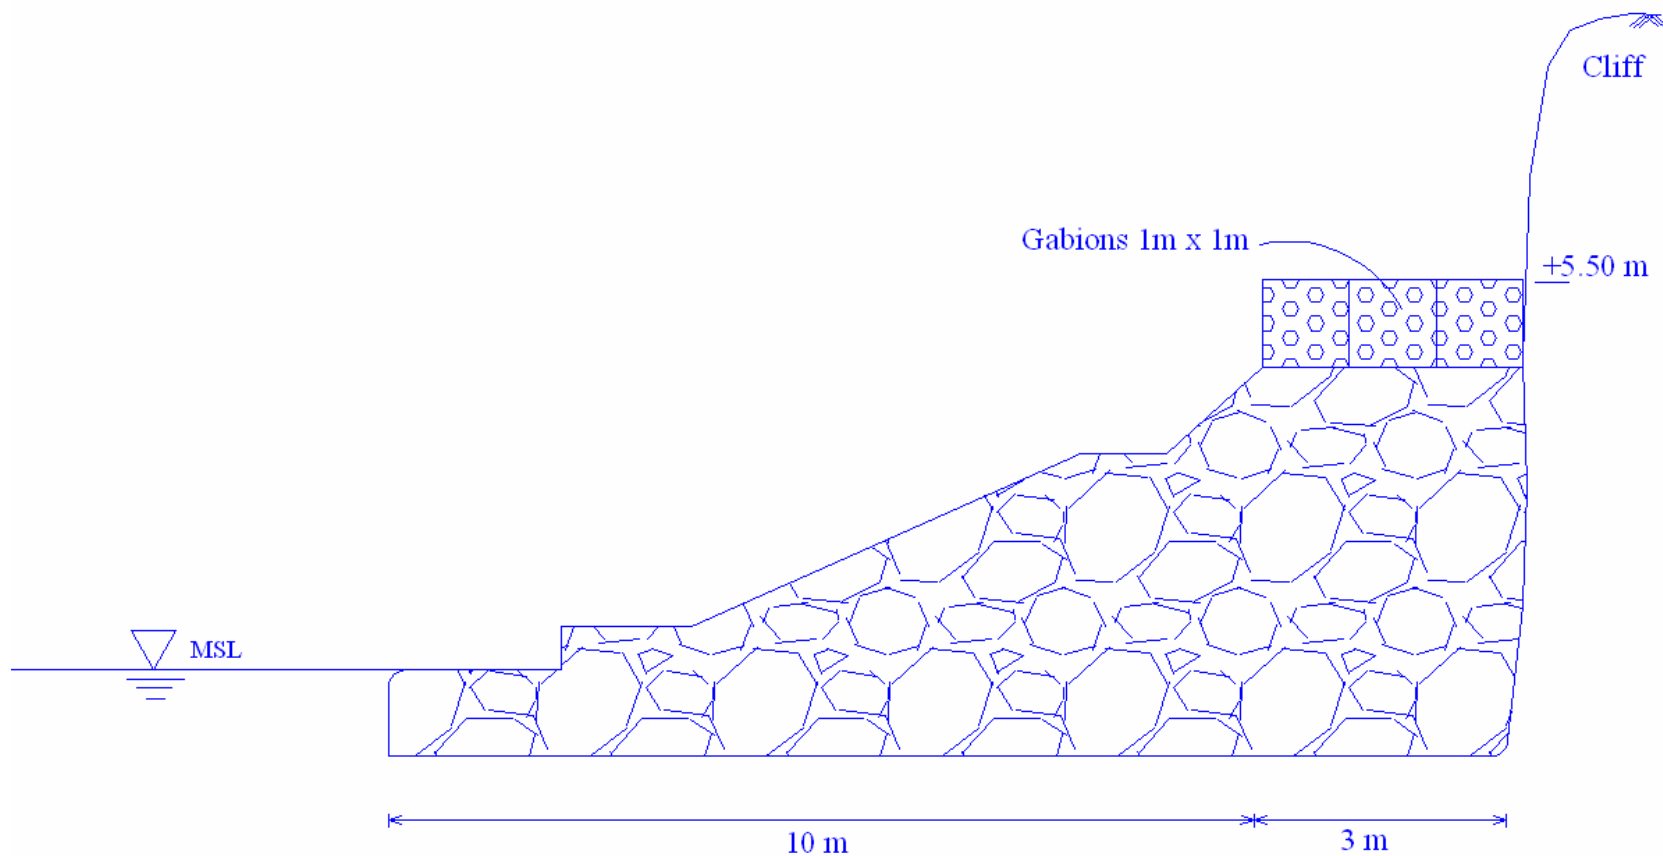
Proposed cross section of seawall with gabions at Janarthanapuram
